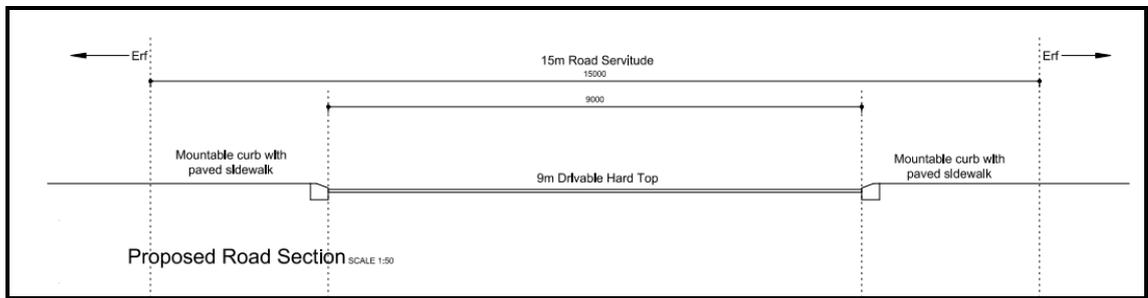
Proposed Road Cross-section (source: Chameleon Architects, 2020) Servicing
